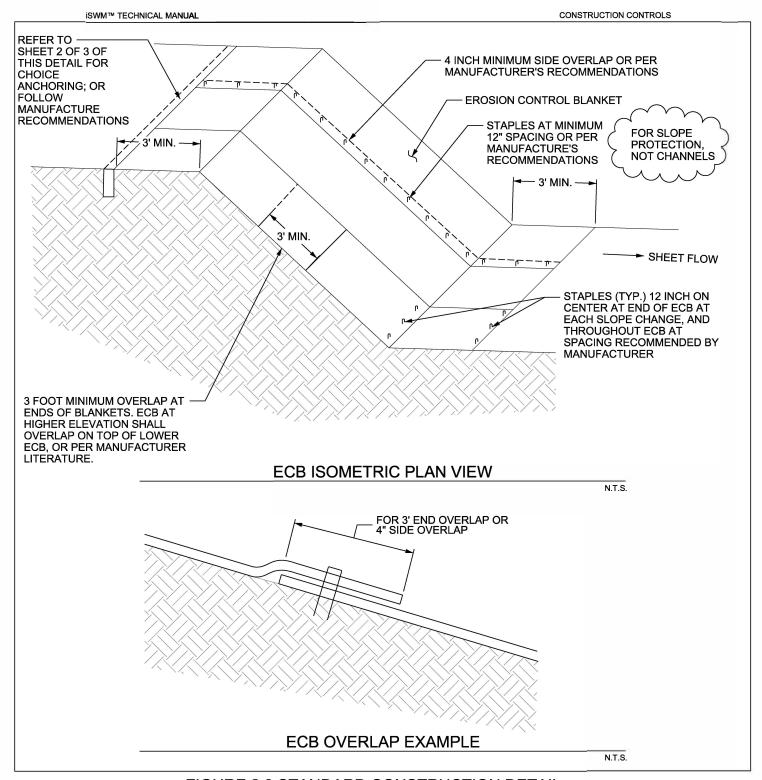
STANDARD CONSTRUCTION DETAIL - TEMPORARY EROSION CONTROL BLANKETS (1 OF 3)
